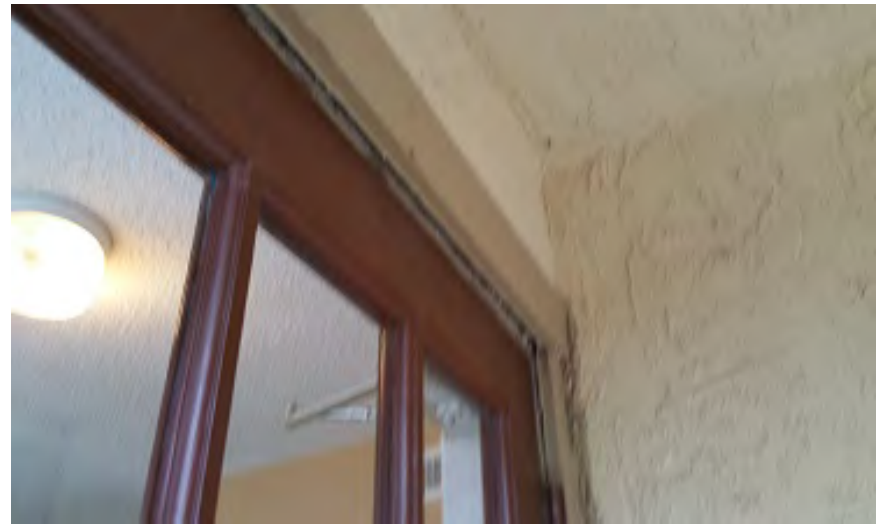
2<sup>nd</sup> Floor: Walkway Crack
